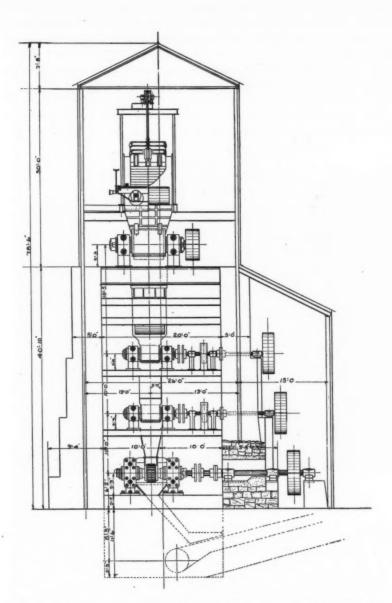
End Elevation of the Crushing Plant of the Edison Portland Cement Company
